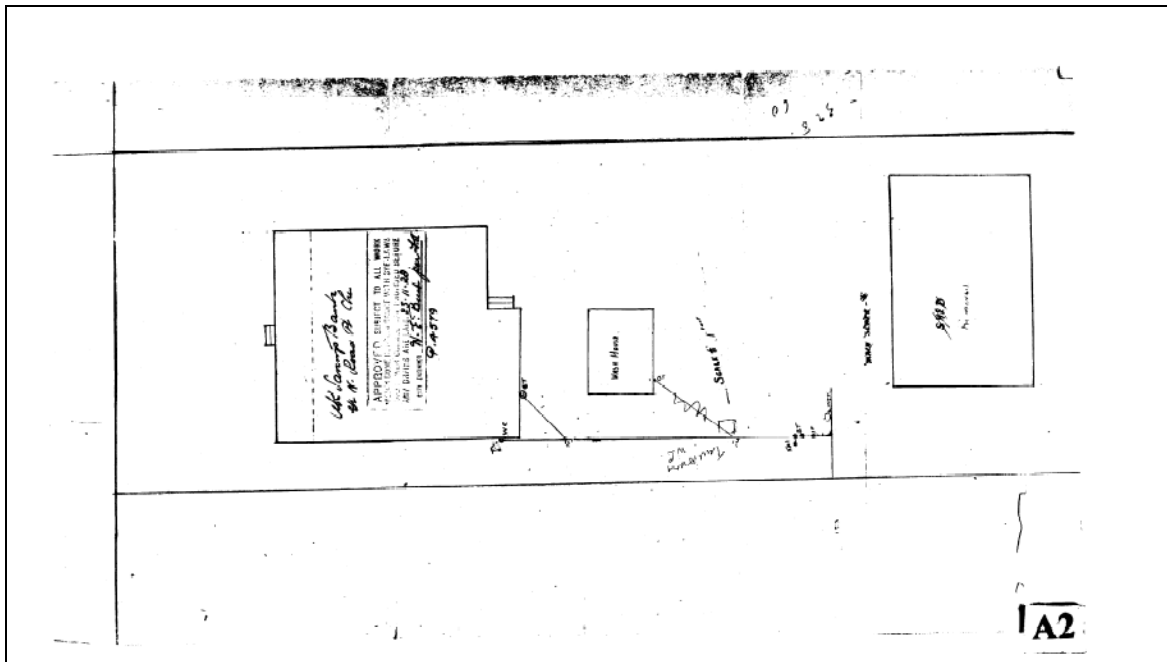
Drainage plan showing original outbuildings - washhouse and shed.
